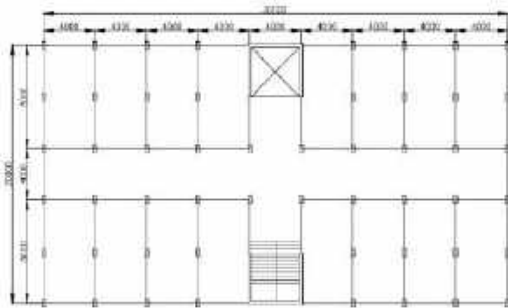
Typical Floor Plan of building (dimensions are in mm)
